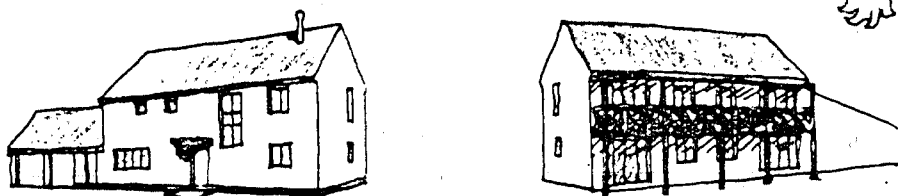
Guildway 'Doon' design - similar to original Woughton design. Note balcony for summer shading.
